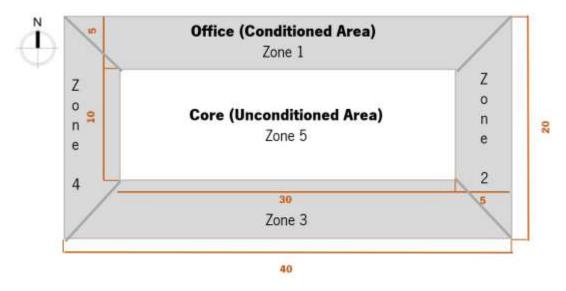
Case study building reference floor plan and thermal zones (Adapted from Brugnera, 2018).
